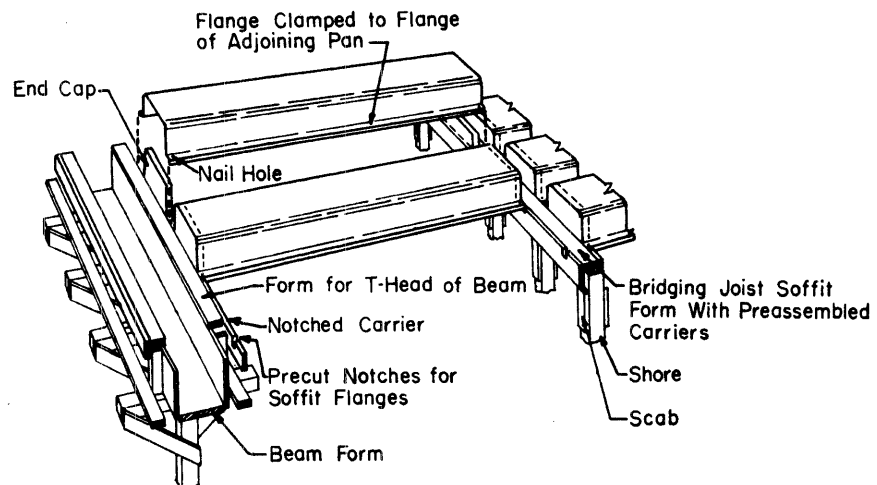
One-way slab form. (Courtesy of American Concrete Institute)
